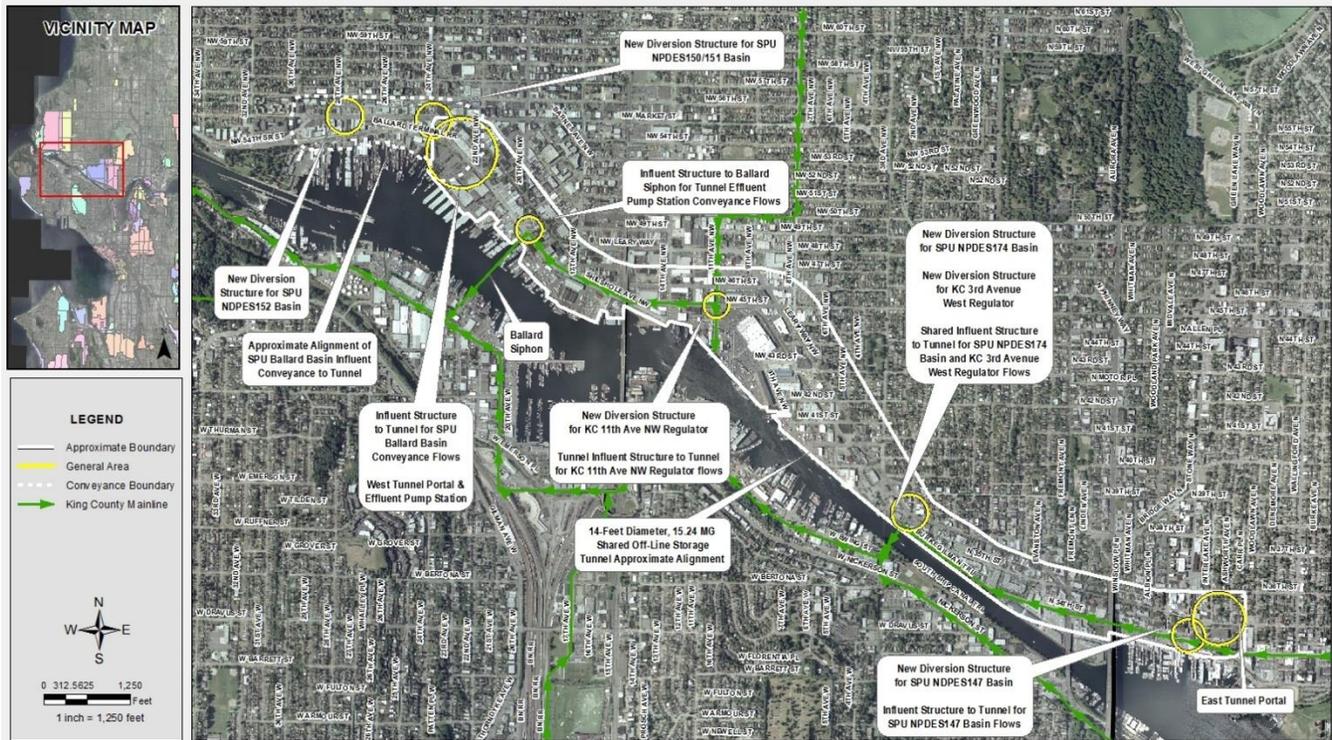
Shared West Ship Canal Tunnel Recommended Control Measure
